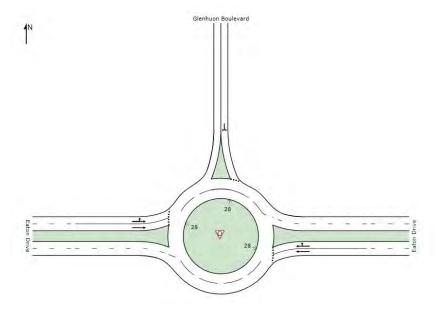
Roundabout Layout for the Intersection of Eaton Drive / Glenhuon Boulevard
